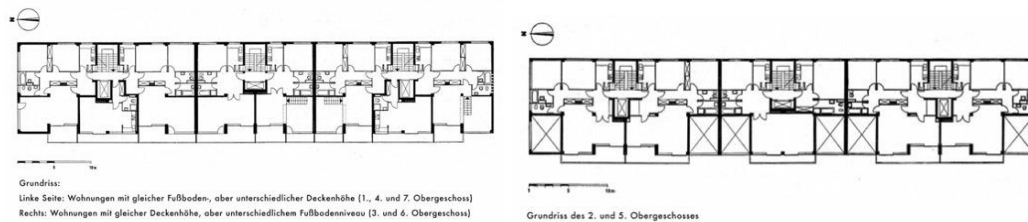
Building no.21, Apartments with the same floor, but different ceiling height: 1, 4 and 7 floor, Apartments with the same ceiling height but different floor level: 3 and 6
